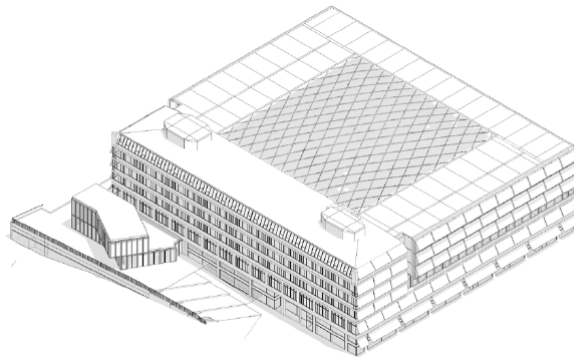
Exterior perspective view of building volumes and courtyard roof. Figure taken from [17]
